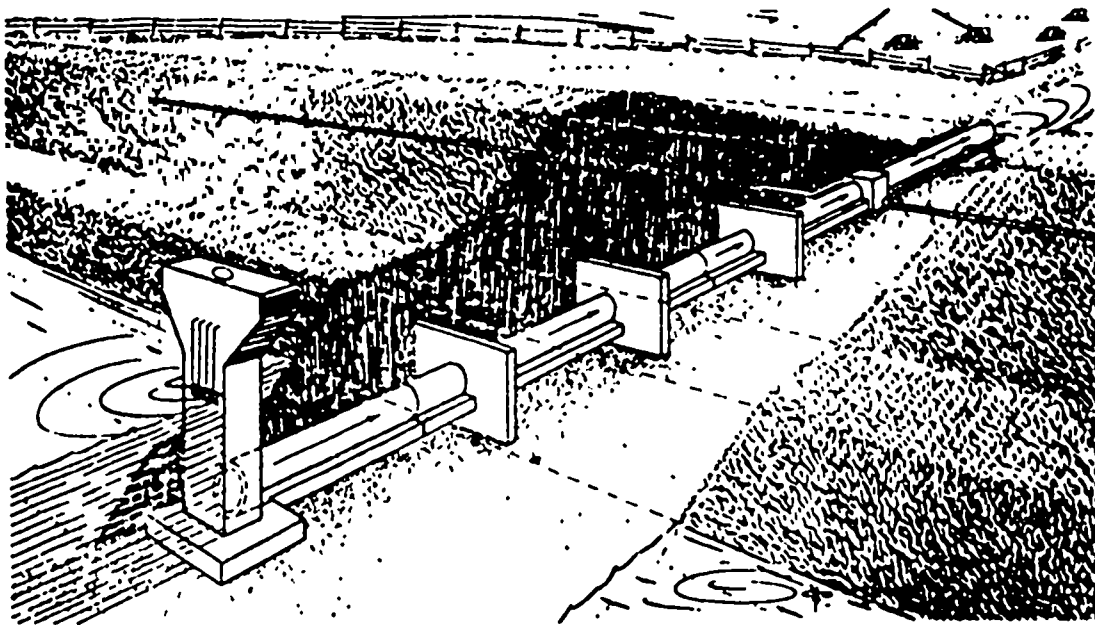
Outlet with Multi-Stage Inlet (U.S. Soil Conservation Service, 1969)
